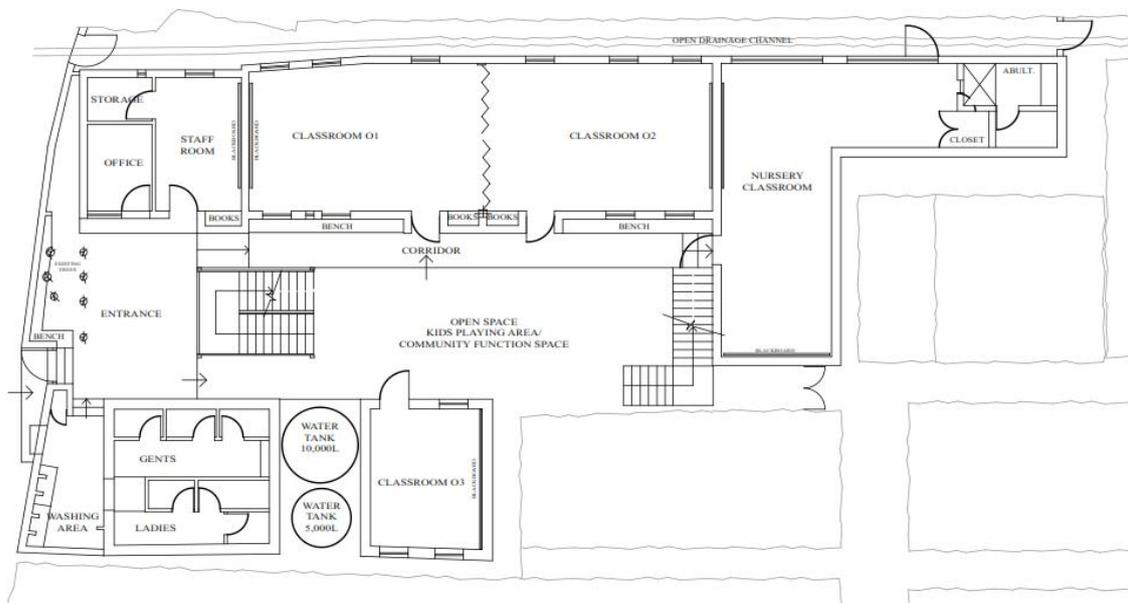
Anwa Junior school floor plan Source: Author, 2017. Modified from KDI drawings
